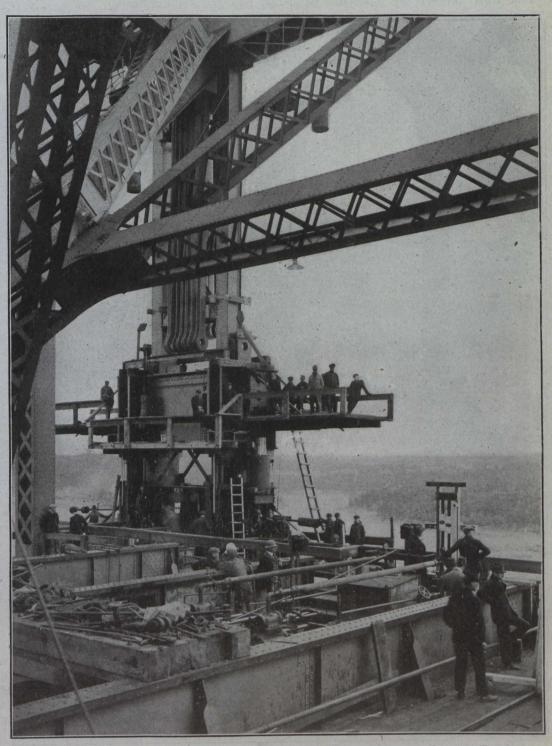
View of Jacking Girder, Hydraulic Jacks, Safety Screws, Central Tell-Tales, Pumps, Operating Valves and CMO Joint Above Upper Jacking Girder (ELG3)
